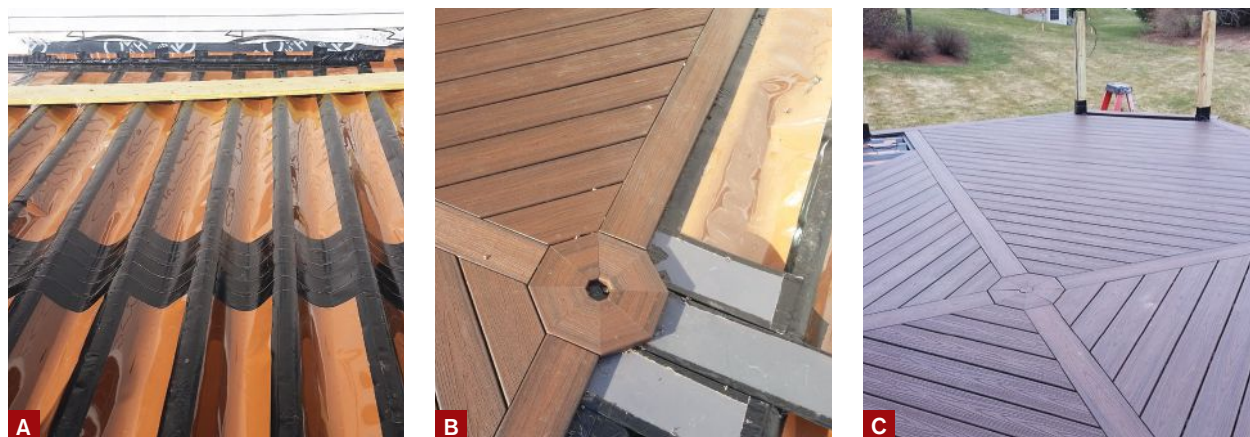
To keep the area below the deck dry, workers installed a Trex RainEscape under-deck drainage system (A). Extra courses of waterproofing tape underneath divider boards and over the blocking needed for the octagonal inlay protect the troughs from damage (B). After the drainage system passed water-testing, Trex decking was installed using hidden fasteners (C).
